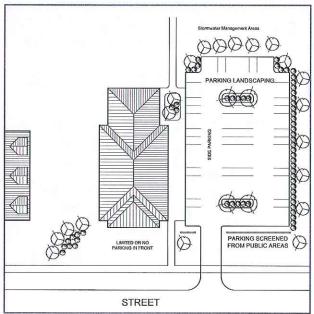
An example parking lot landscape plan with perimeter plantings and screening elements.
